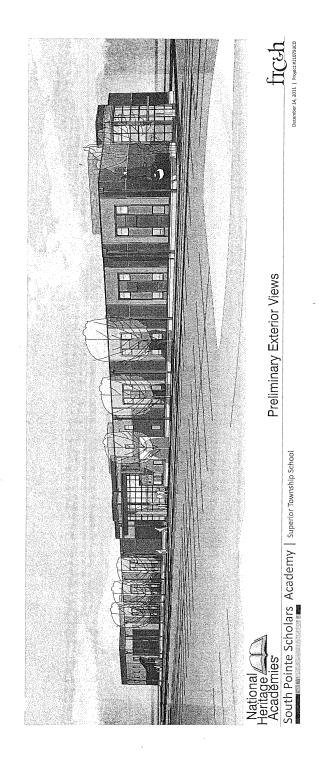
EXHIBIT F SAMPLE EXTERIOR ELEVATION
